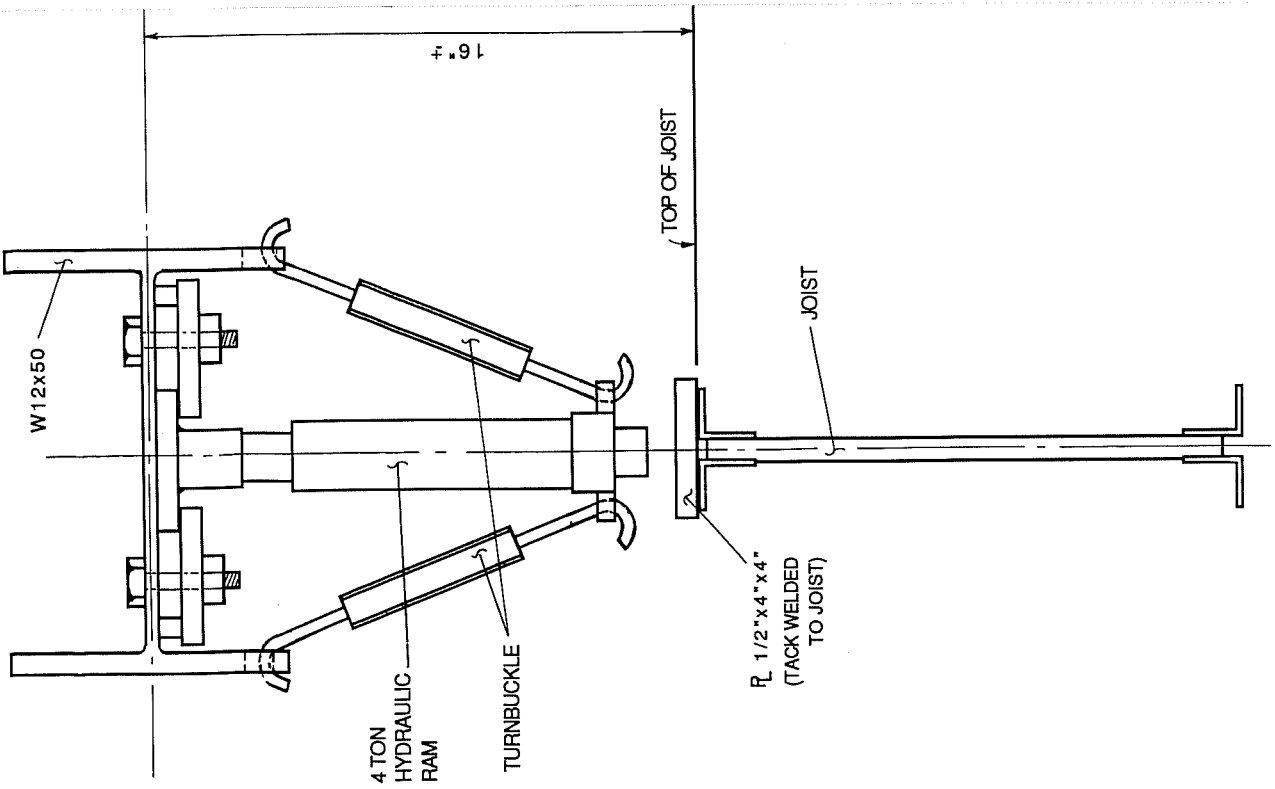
Typical Detail at Hydraulic Loading Ram
